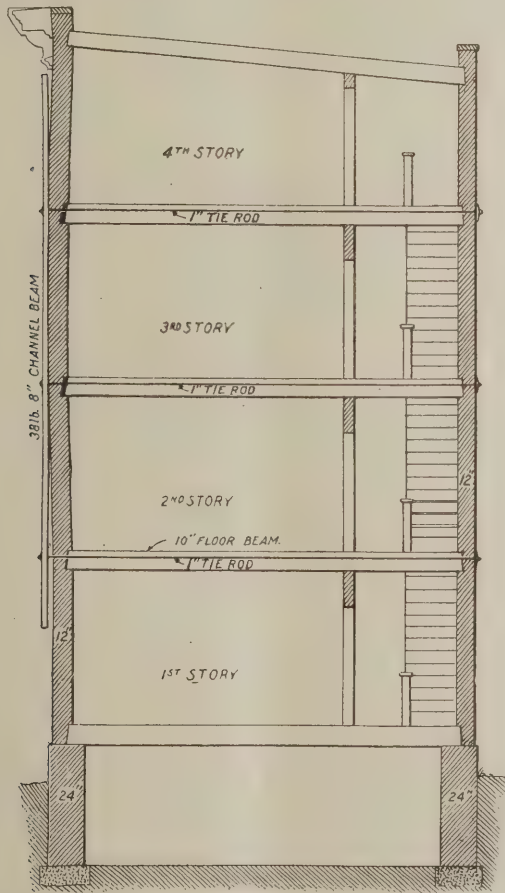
Vertical Section Through Building, Showing Method of Securing Channel Beams to the Bulging Front.
